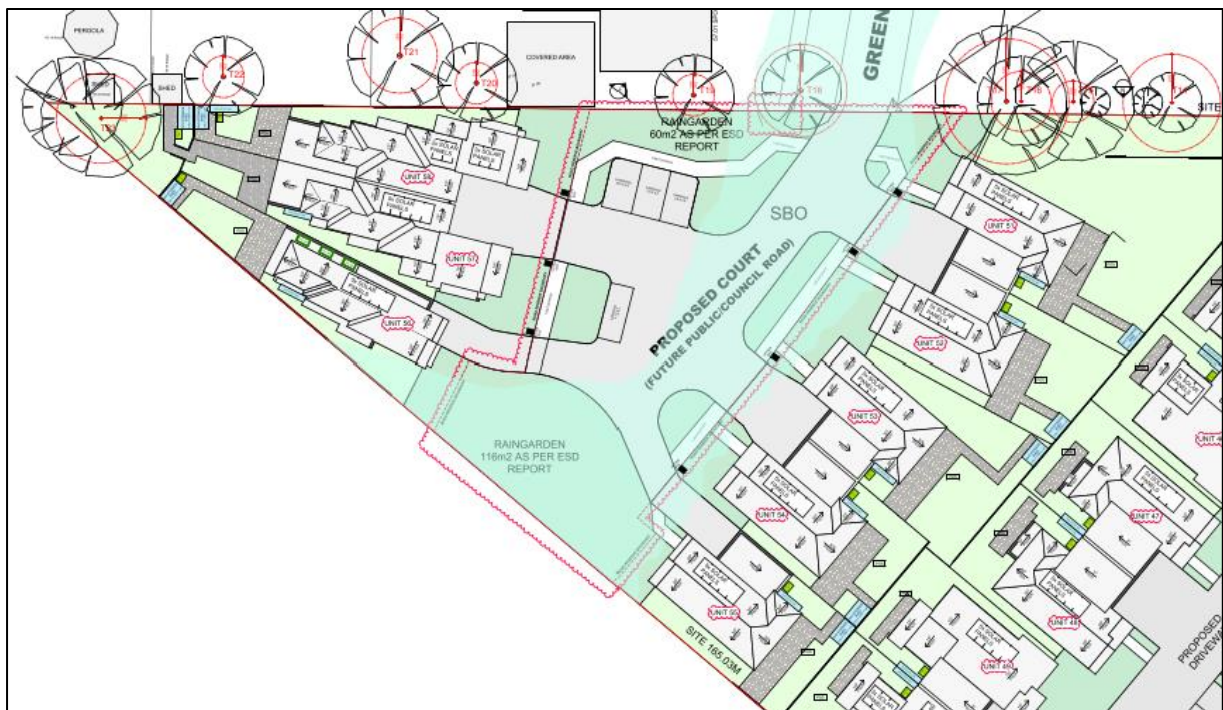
Site layout plan showing entrance to the lower part of the site from Greenway Court.
